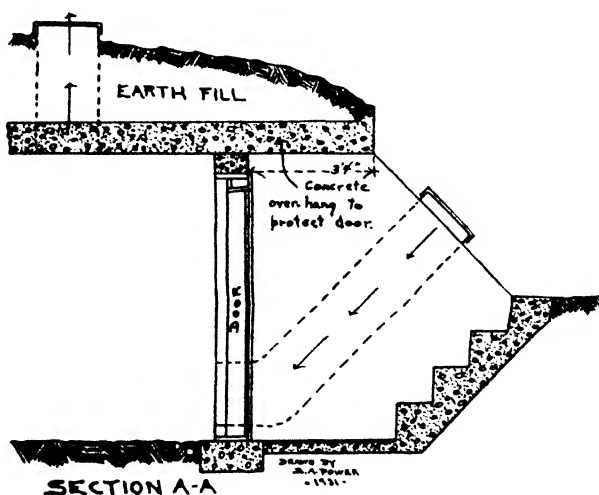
Construction details of Storage Cellar at the Ohio Station
